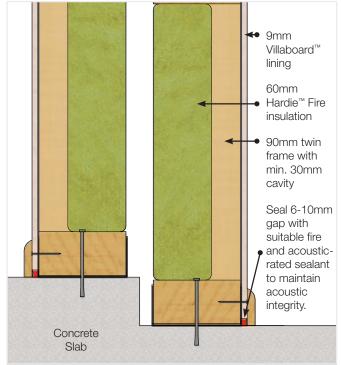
HARDIE™ SMART INTERTENANCY WALL SYSTEM BASE TO STEPPED SLAB DETAIL
